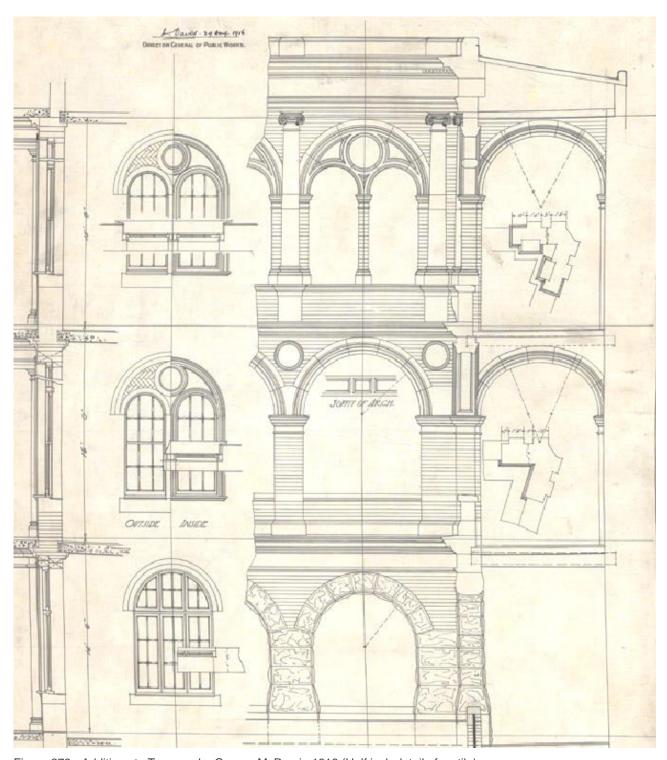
Additions to Treasury by George McRae in 1916 (Half inch detail of cortile)
